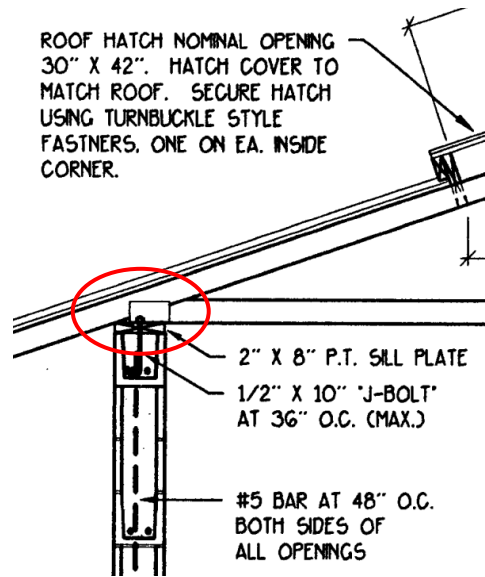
Inadequate Wall Out-of-Plane Anchorage Connection
